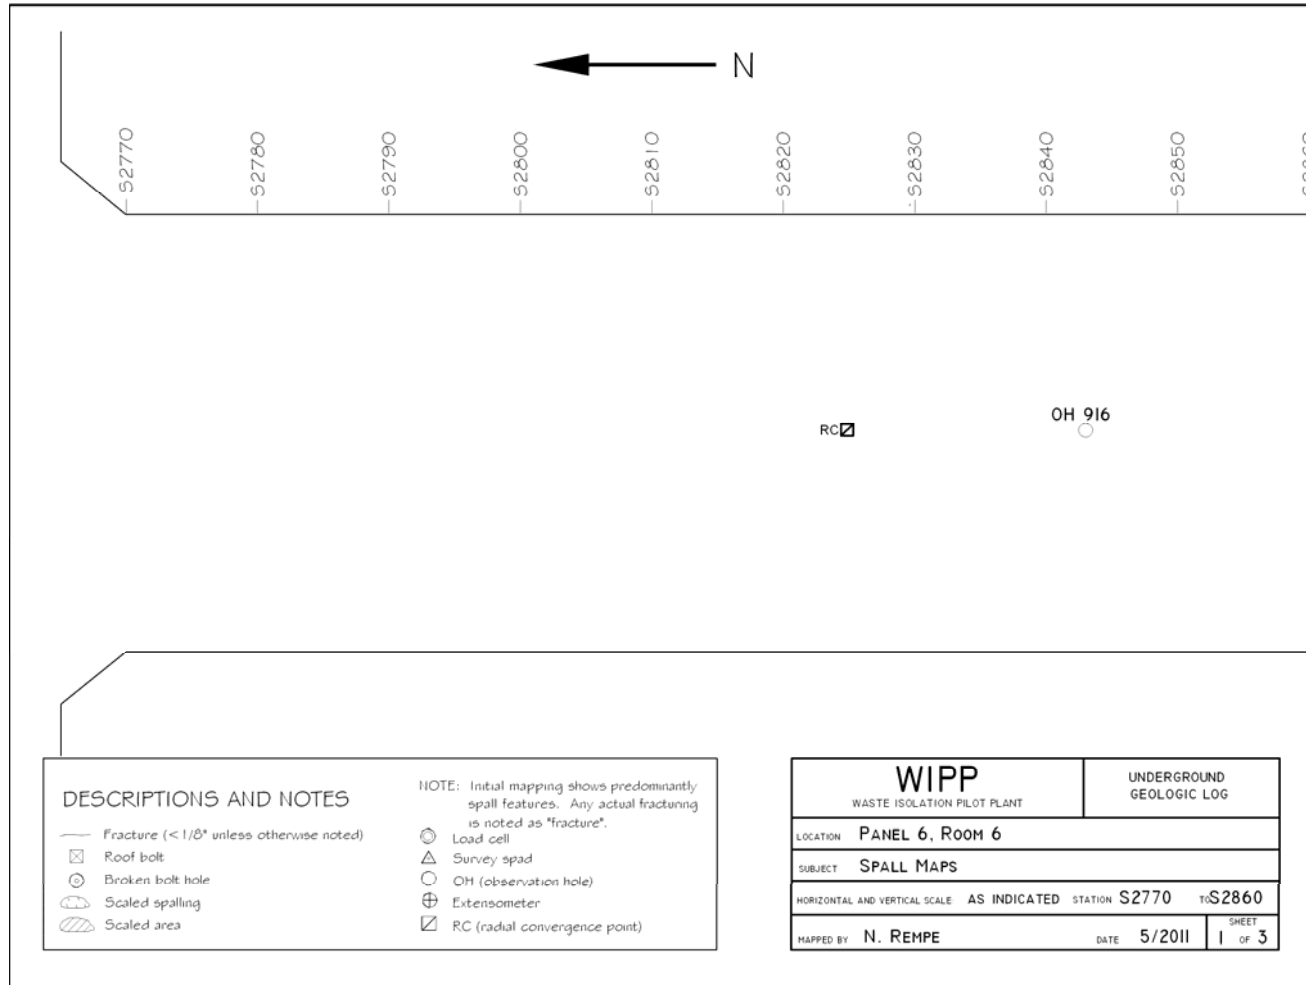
Panel 6 Room 6, S2770-S3060 Roof Fractures (Sheet 1 of 3)
